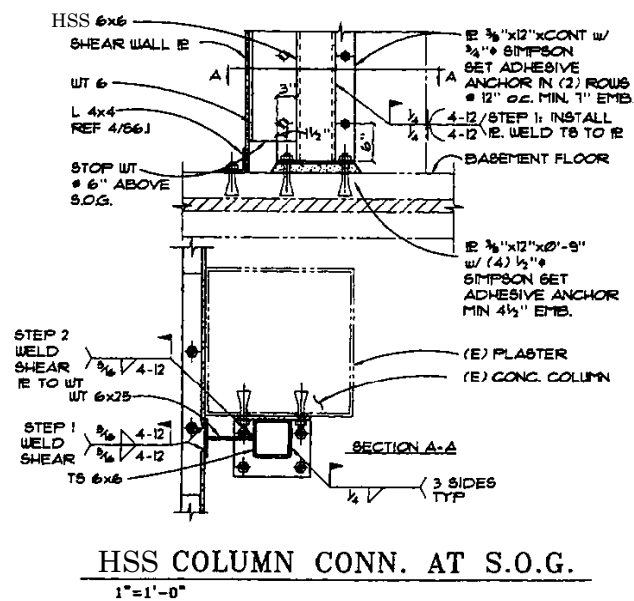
Connection of SPW to existing R/C frame (courtesy of KPFF Consulting Engineers, Portland, OR).
